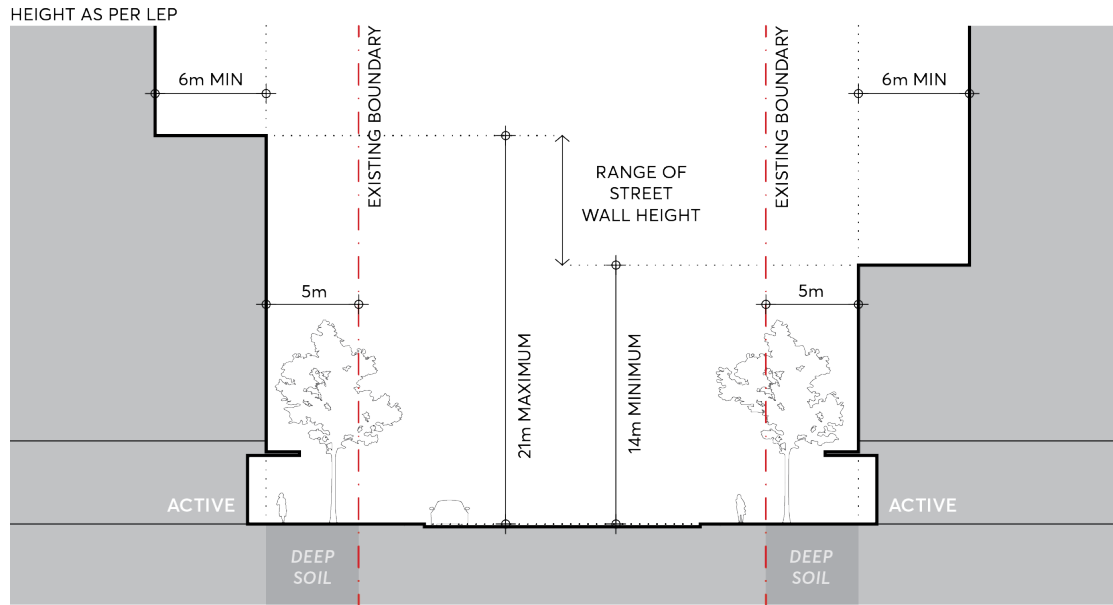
Church Street (Section A) Setbacks and Street Wall Height
